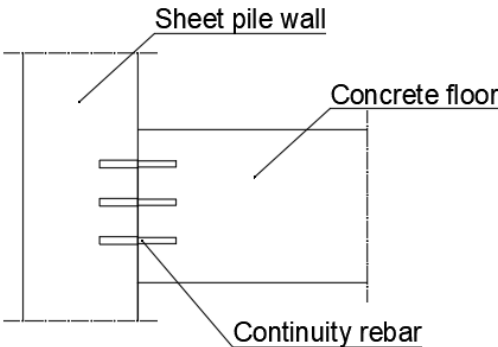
Connection between sheet pile wall and concrete floor, using continuity rebar.
